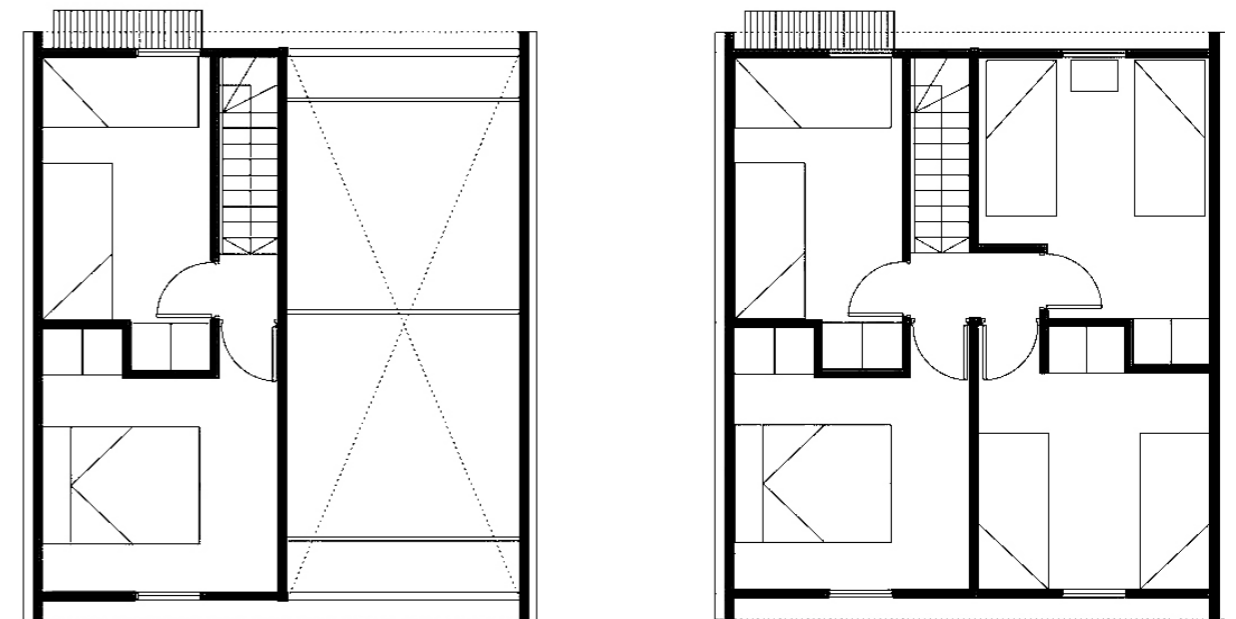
Villa Verde first floor plan transformation (Alejandro Aravena, 2010)
